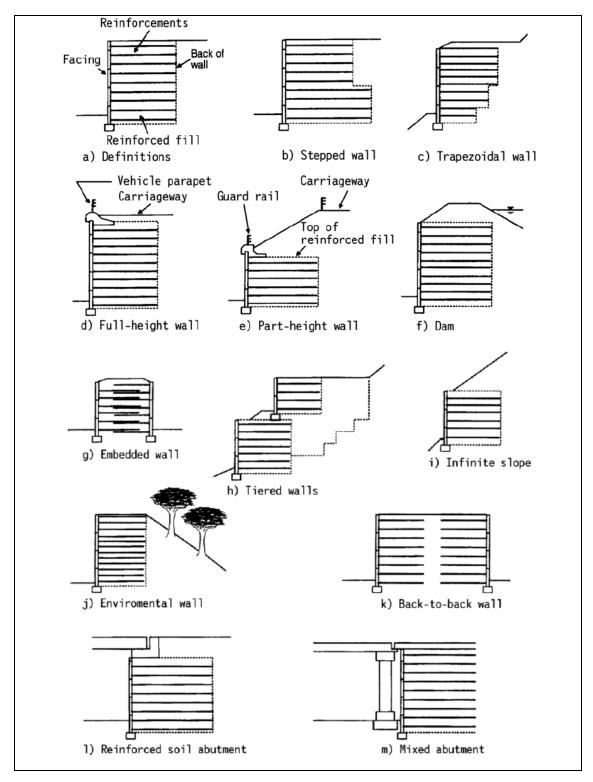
Various types of walls and abutments (SANS207, 2006)
